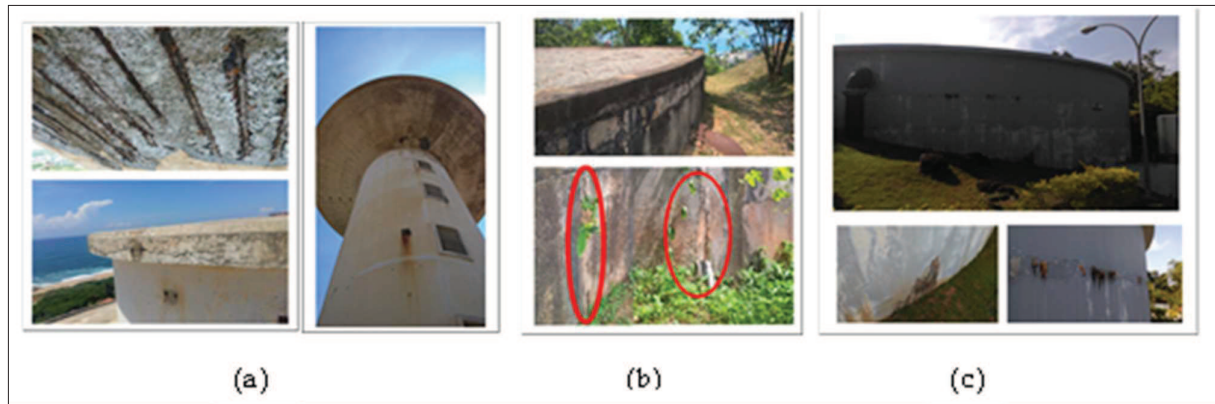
Existing reinforced concrete water tanks with corrosion effects: (a) structure no. 13 at Hambantota Sri Lanka; (b) structure no. 02 at Matara Sri Lanka; and (c) structure no. 19 at Galle Sri Lanka
